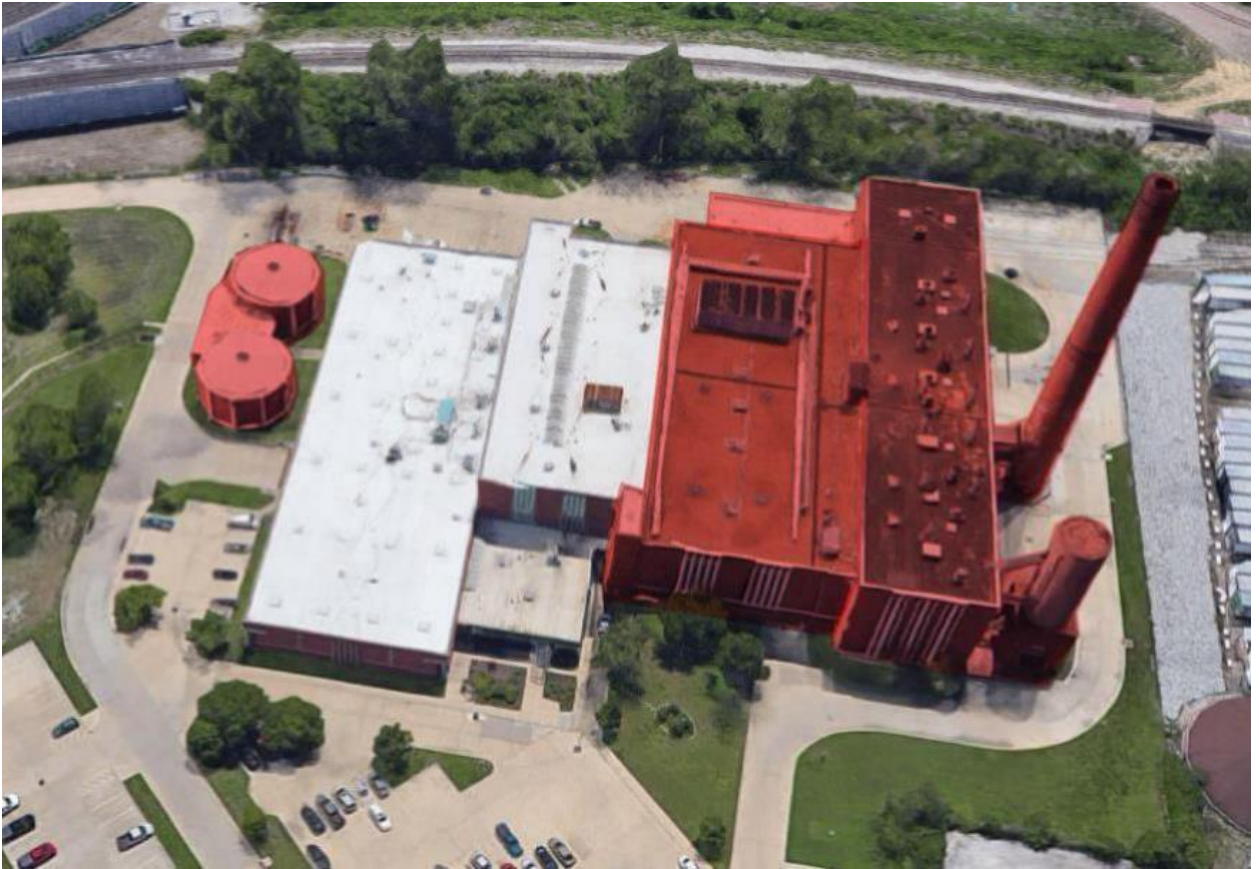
Alternative Evaluation - Solids Handling Building and Storage Tanks
